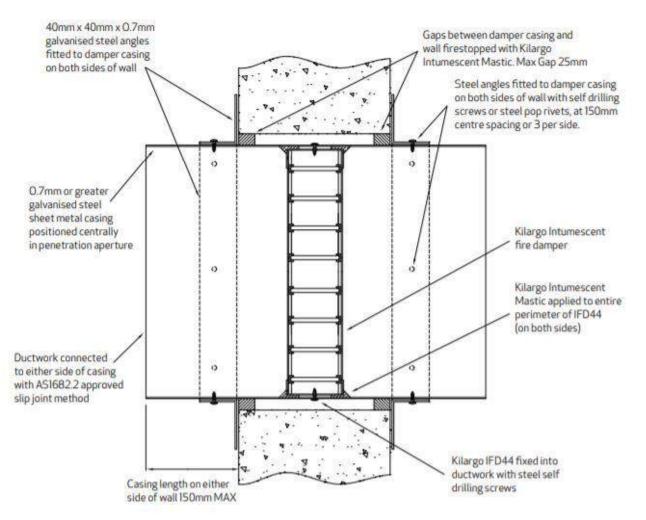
Example of a Fire Damper installation (Source: Kilargo)
